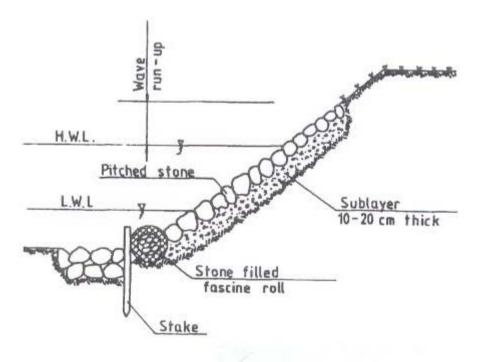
Slope protection with pitched stone (Source: Przedwojski, 1995)
